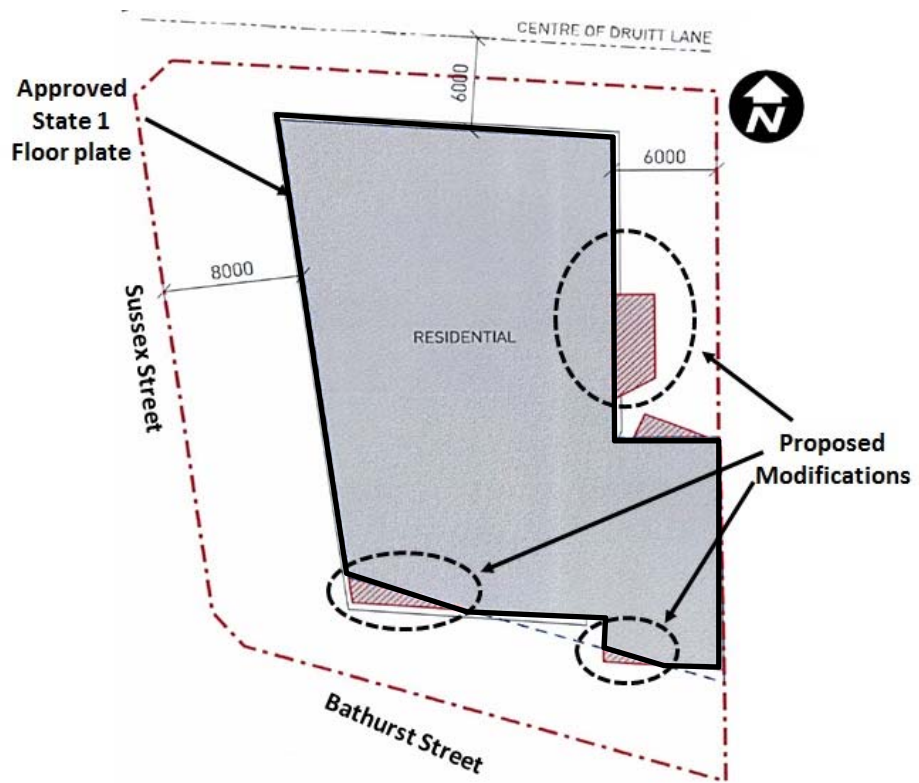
Proposed modifications to floor plates – levels 11 to 24.
